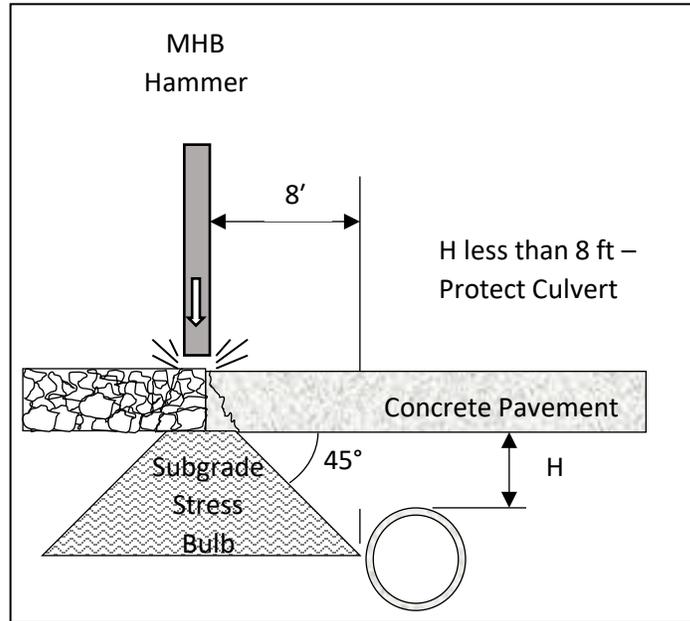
Drawing. Subgrade stress bulb under MHB hammer at pipe culvert.
